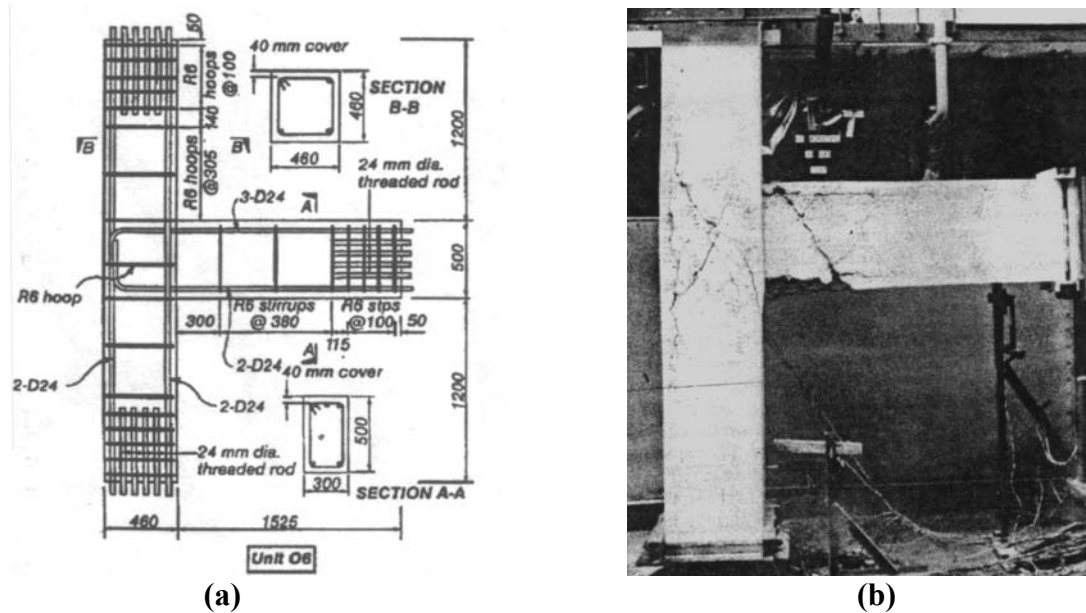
(a) Exterior joint detail demonstrates anchorage of beam rebar bent into the joint. (b) The same joint exhibits shear failure of the beam. (Hakuto 2000)
